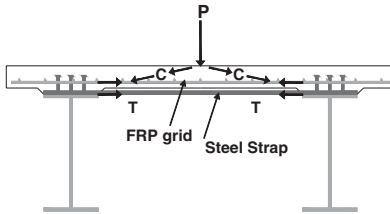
Cross-section of a second generation steel-free concrete bridge deck slab.
